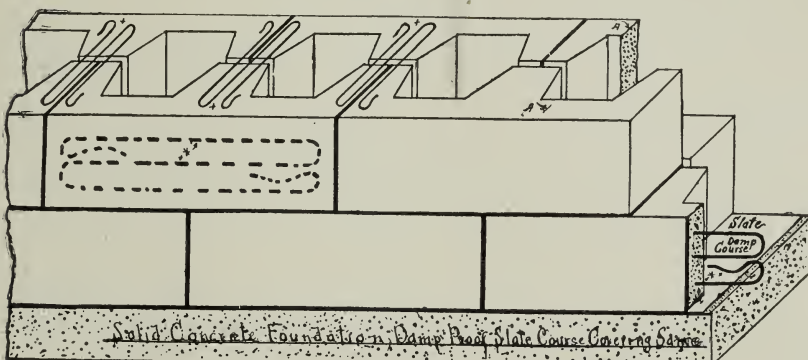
Reinforced Concrete Blocks. E-shaped Backing Blocks.
